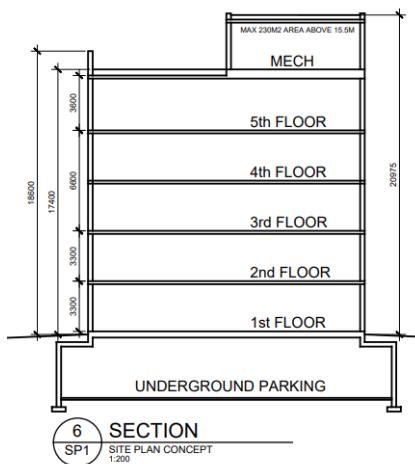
PROPOSED BUILDING HEIGHT – 3665 MACKLEM STREET, NIAGARA FALLS, ON
